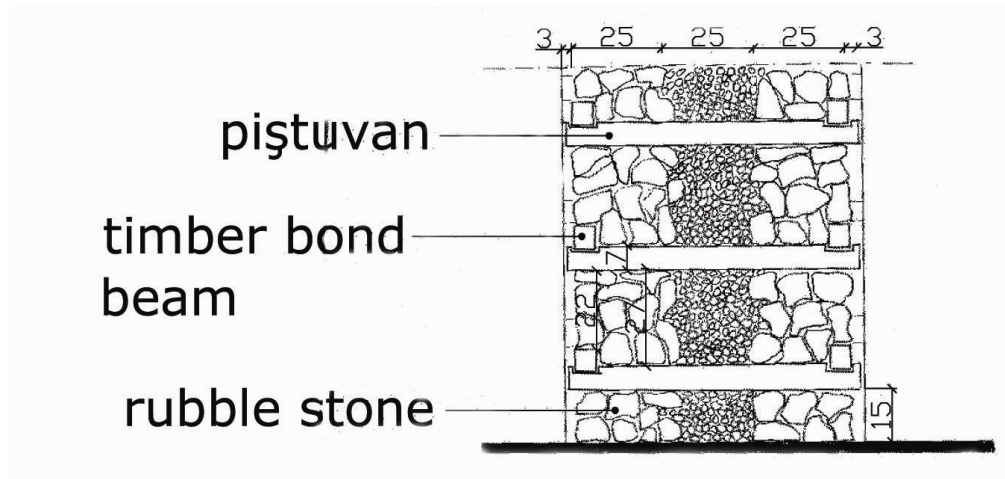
11 Drawing of the wall type 4. Çelik 2008.
